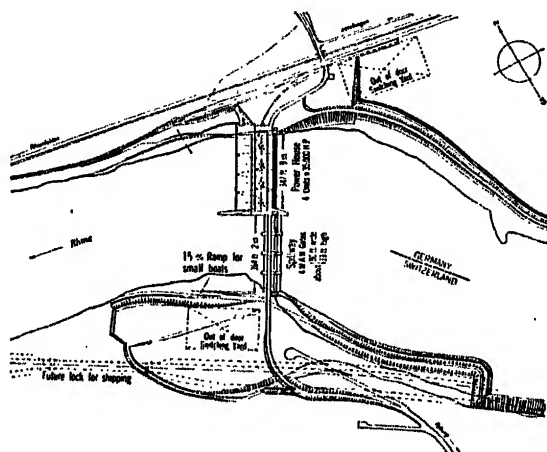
RYBORG-SCHWORSTADT POWER PLANT. GENERAL PLAN
